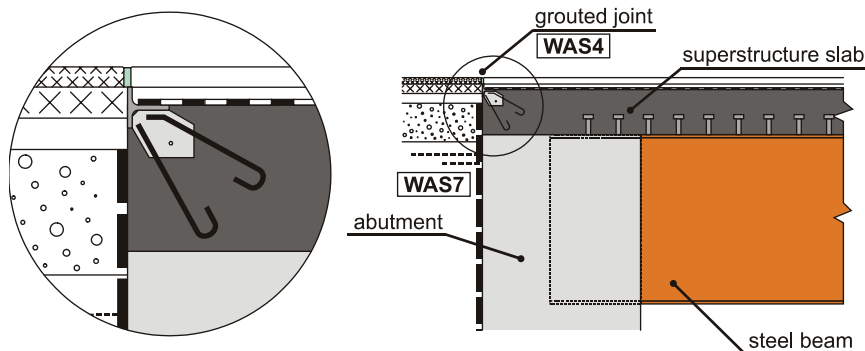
design propositions acc. to (RiZ-ING, 2007), WAS4
